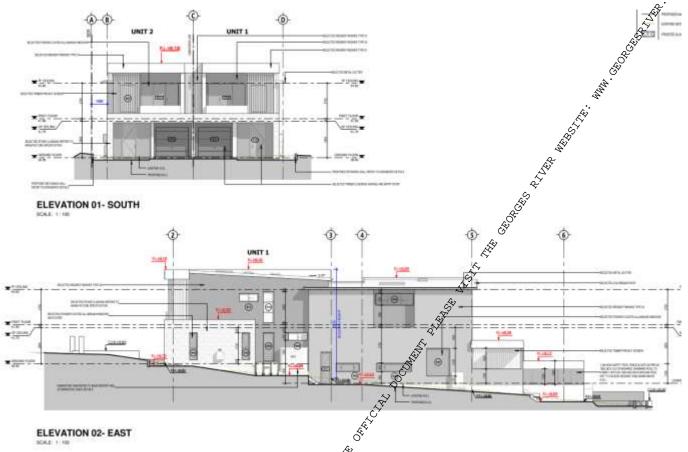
South (front) and east elewations (Source: Architectural Plans)
